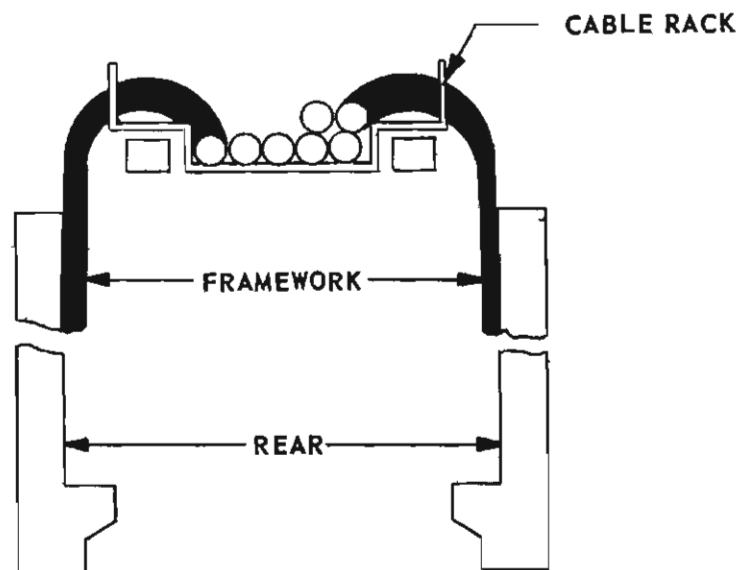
END VIEW OF REAR AISLE SHOWING POSITION OF OVER AISLE CABLE RACK
